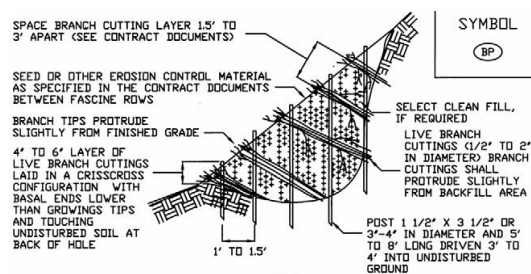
Typical branch packing cross-section (NYS DEC, 2005).
